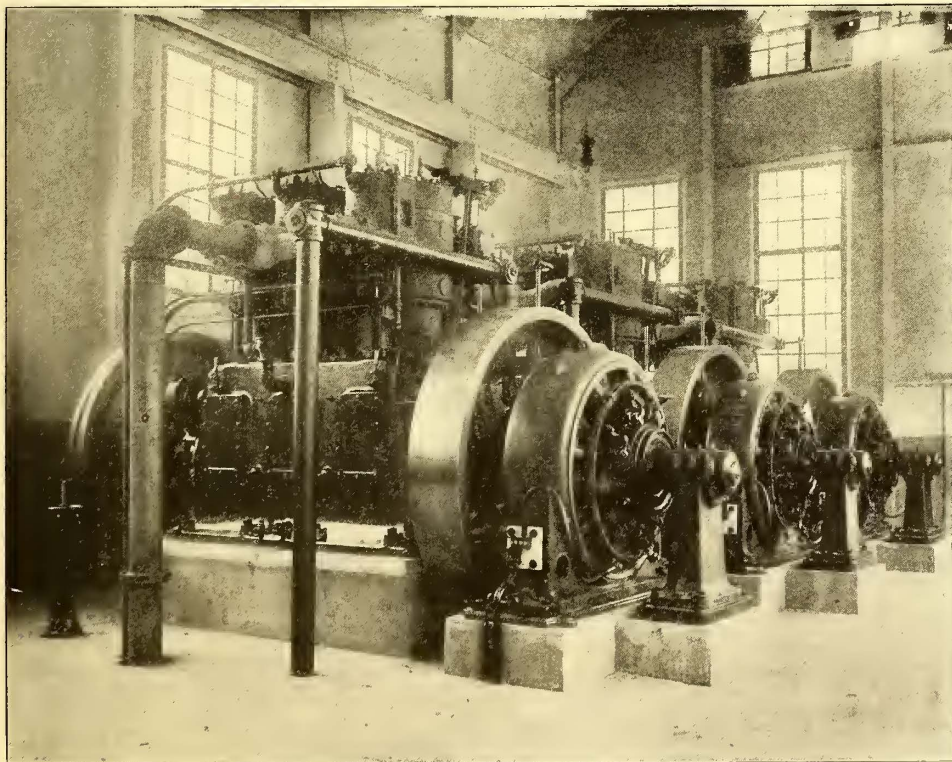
SECTION OF 1900-HP INDUSTRIAL GAS PLANT OF THE WINCHESTER REPEATING ARMS COMPANY, SHOWING SOLE-PLATE PIER CONSTRUCTION
